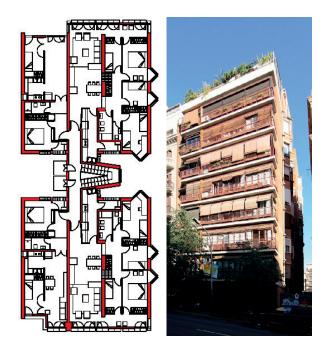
E. Donato Folch. House in calle Rosselló. Floor plan scale 1:500 and view from the street. Redraw and photo M. Lucchini.
